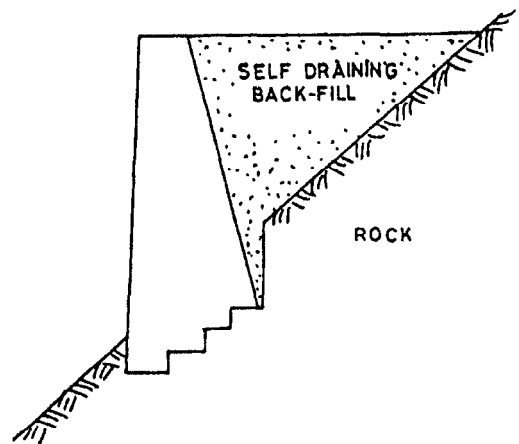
STEPPING OF FOUNDATION OF WALL ON ROCK SLOPE
